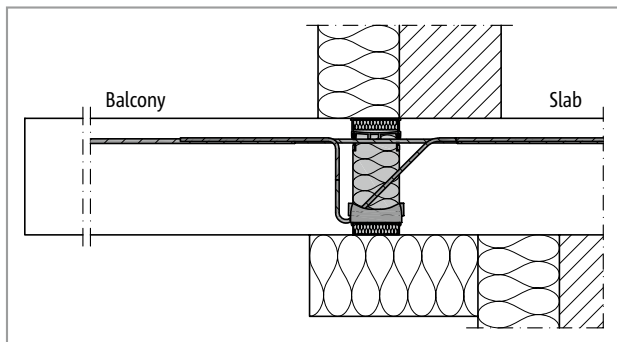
Schöck Isokorb® T type K: Connection with indirectly positioned floor and TICS
